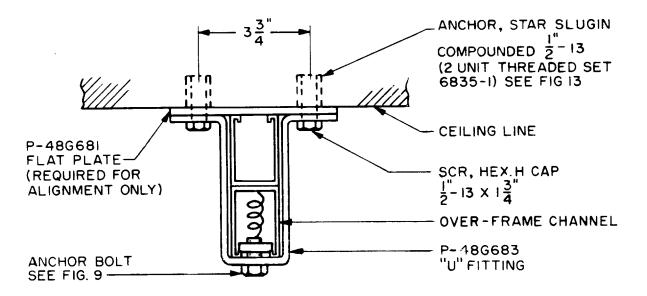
Fastening Overframe Channel to Ceiling at Vent Duct or Column Cap—Using Cap Screws (A&M Only)
